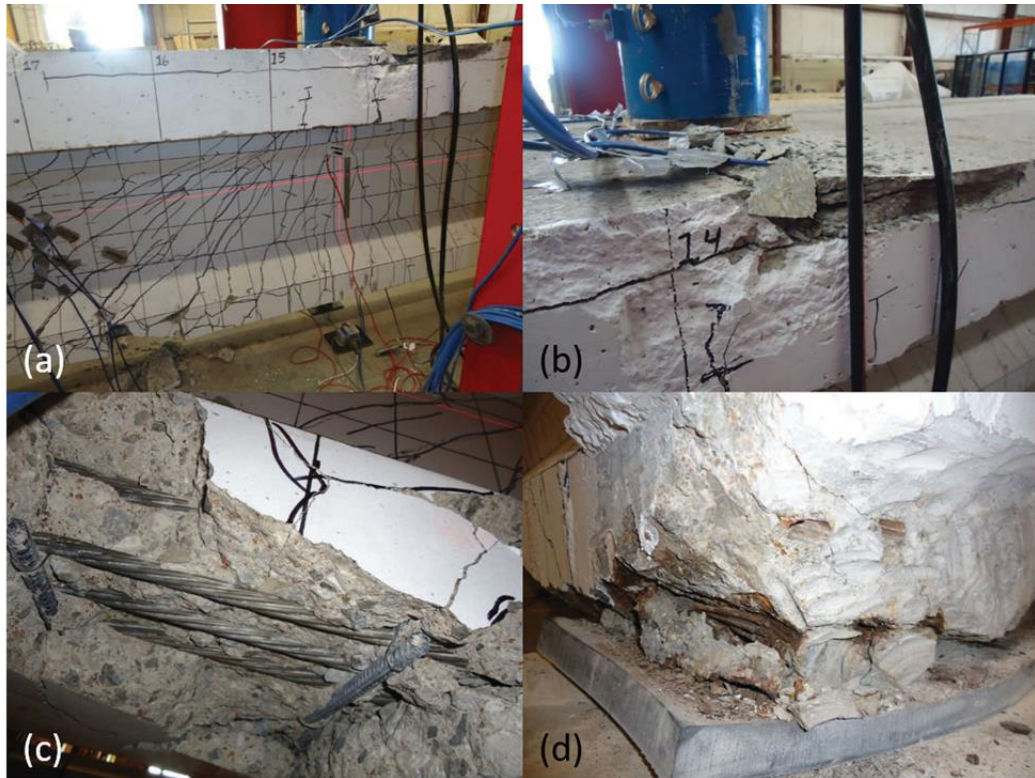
Final condition of girder after test C1: (a) shows overall condition at load point, (b) shows crushing at deck, (c) shows exposed strands due to bond-shear cracking, and (d) shows strand slip of roughly one inch as well as strand corrosion
